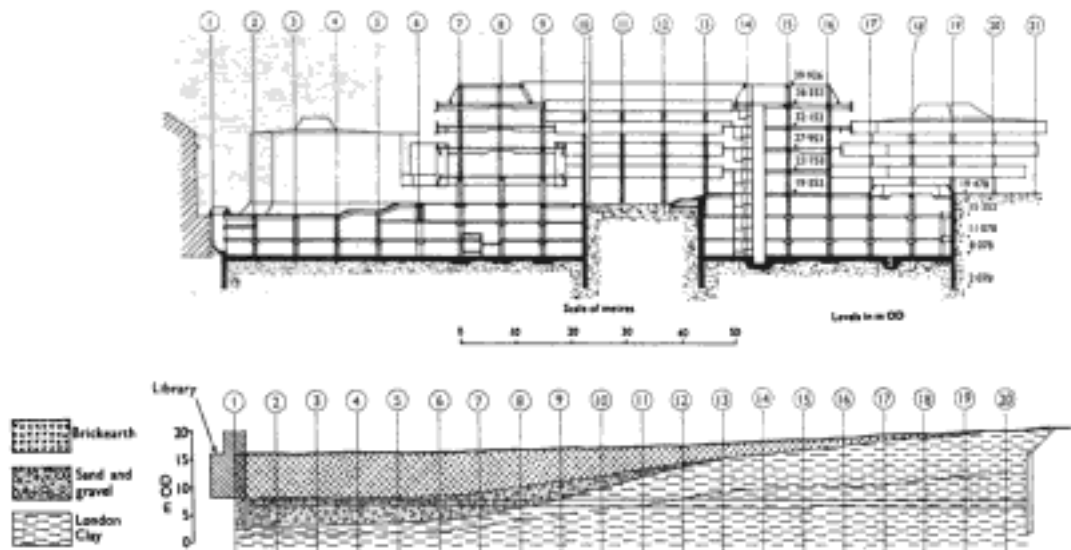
Basement construction: diaphragm wall propped from completed raft construction. Section through substructure and geological section, Kensington Town Hall, London (Corbett et al.⁸)
